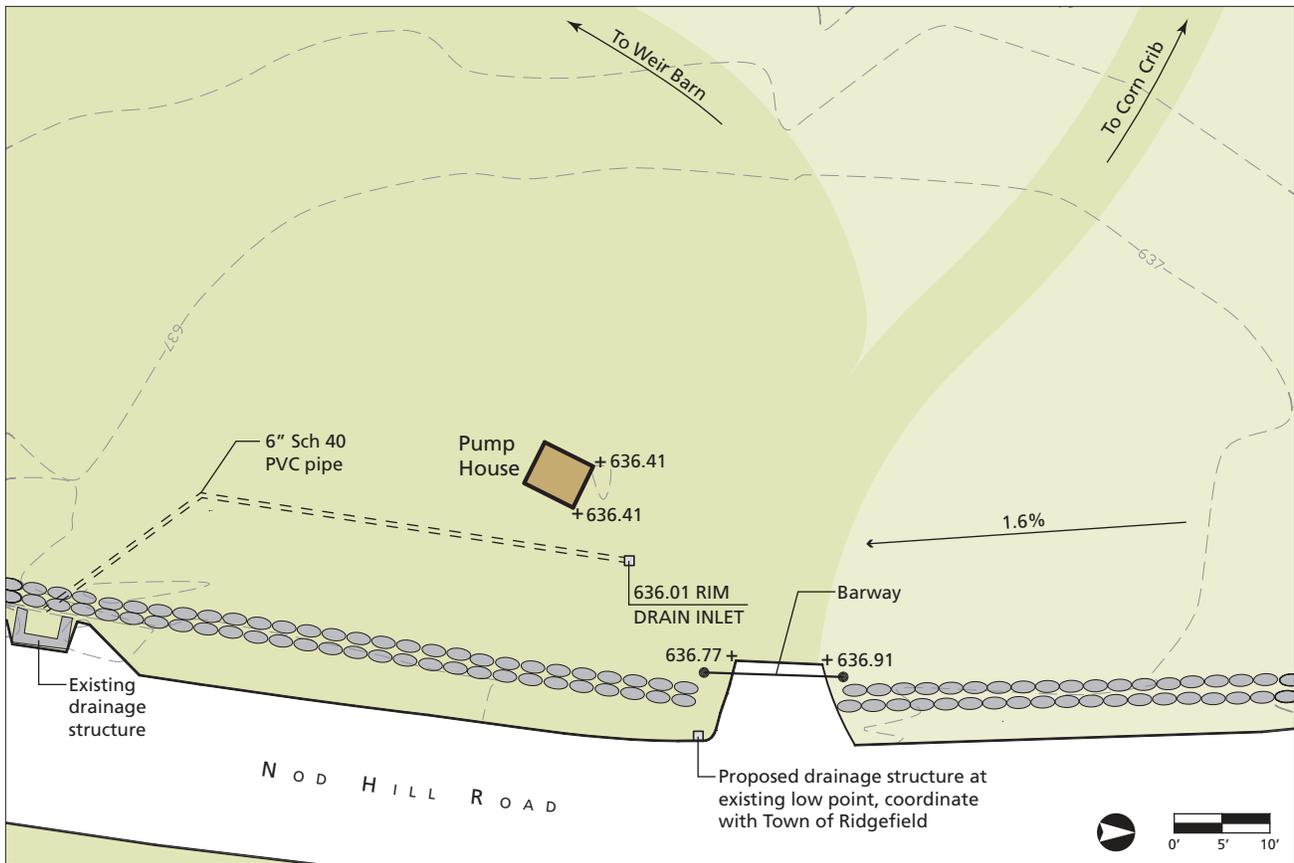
Diagrammatic plan showing fine grading around the Pump House and the addition of subsurface structures to improve drainage, 2012 (OCLP).
